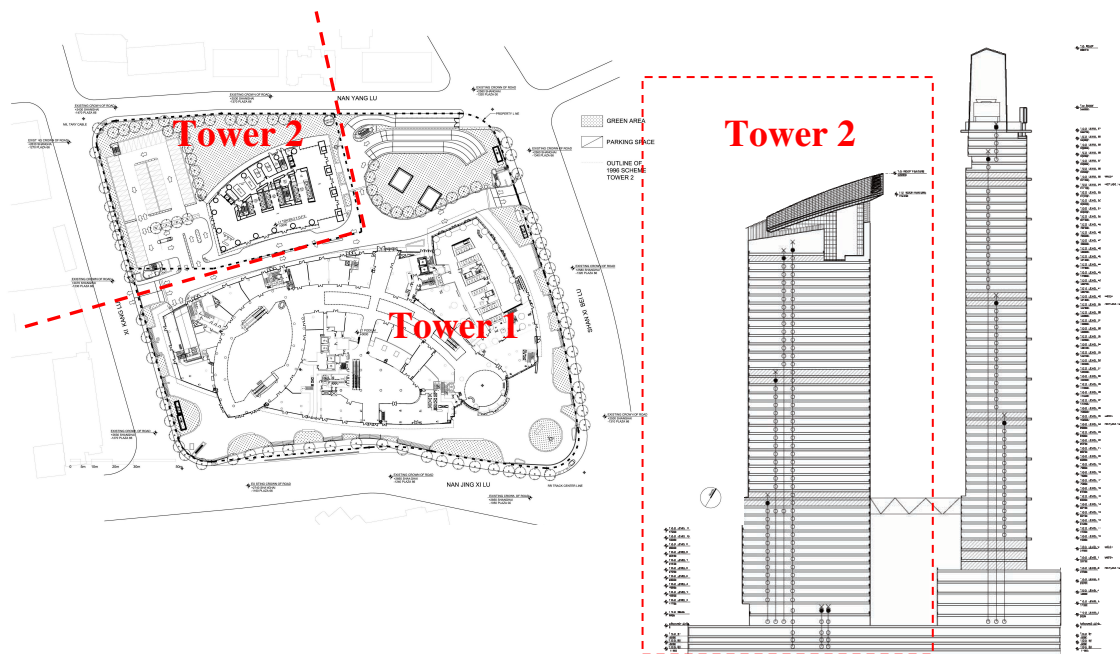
PLAZA 66 TOWER 2 SITE MAP AND BUILDING ELEVATIONS
